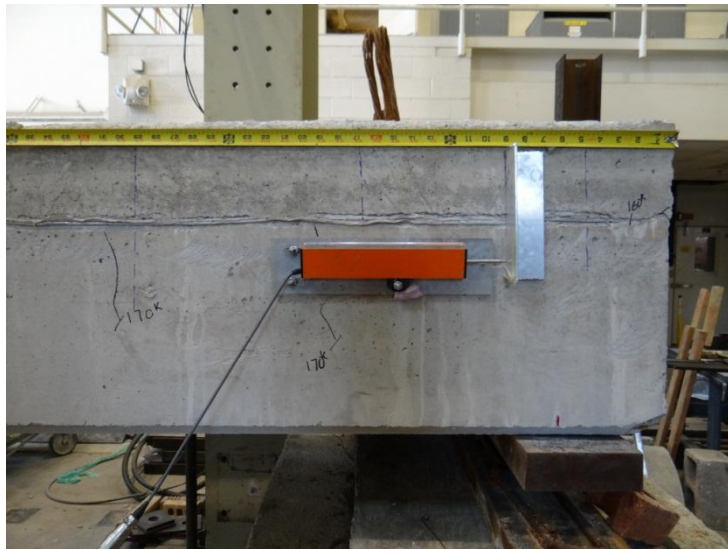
Vertical cracks close to beam ends (South-East side)
